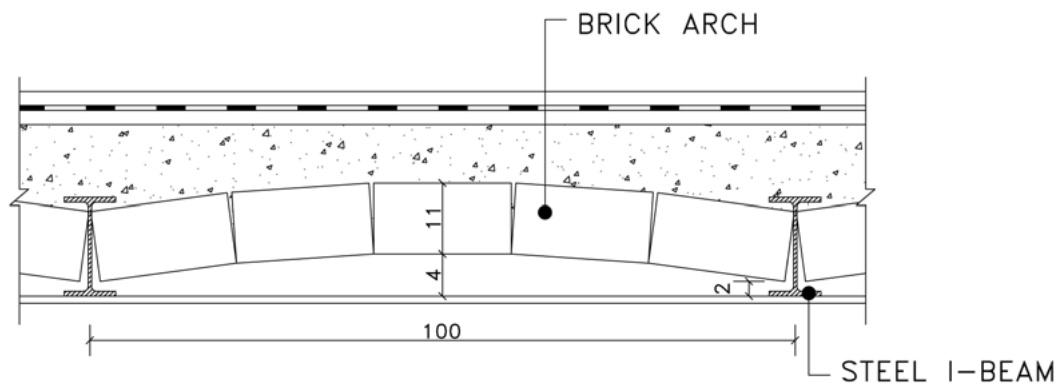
A typical section of steel I-beam jack-arch flooring system (length dimension is cm).
